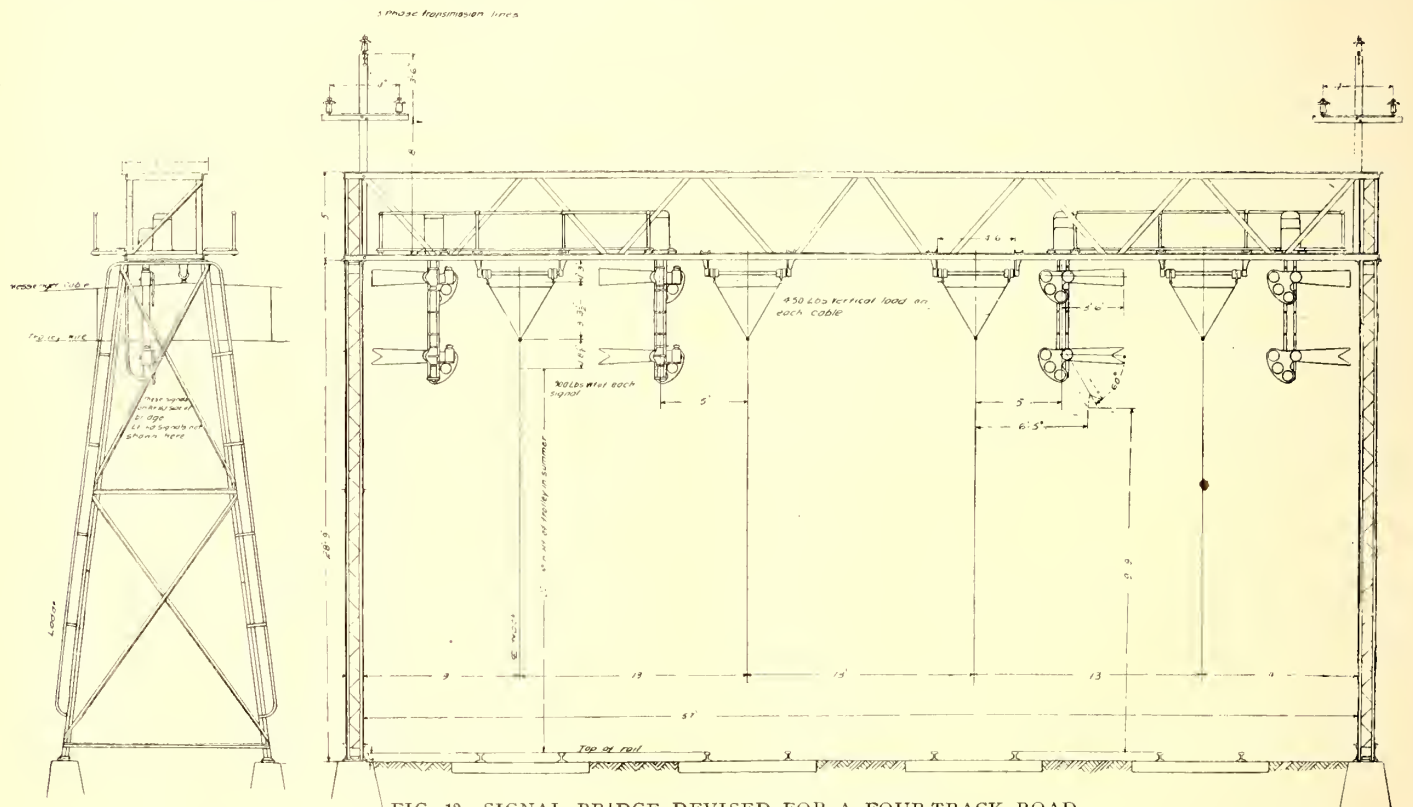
SIGNAL BRIDGE DEVISED FOR A FOUR-TRACK ROAD
